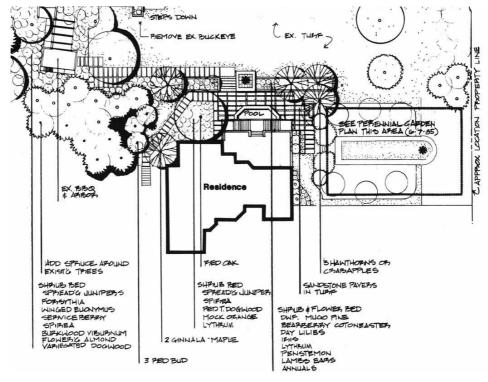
Part of landscape plan of private residence in Denver, Colorado. Plan by EDAW Inc. 1985. (Reid, 1987) In Sweden, the style is somewhat more discrete (Figure 20). The often-close cooperation with building architects is evident when the site planning is presented on floor plans (Figure 21).
